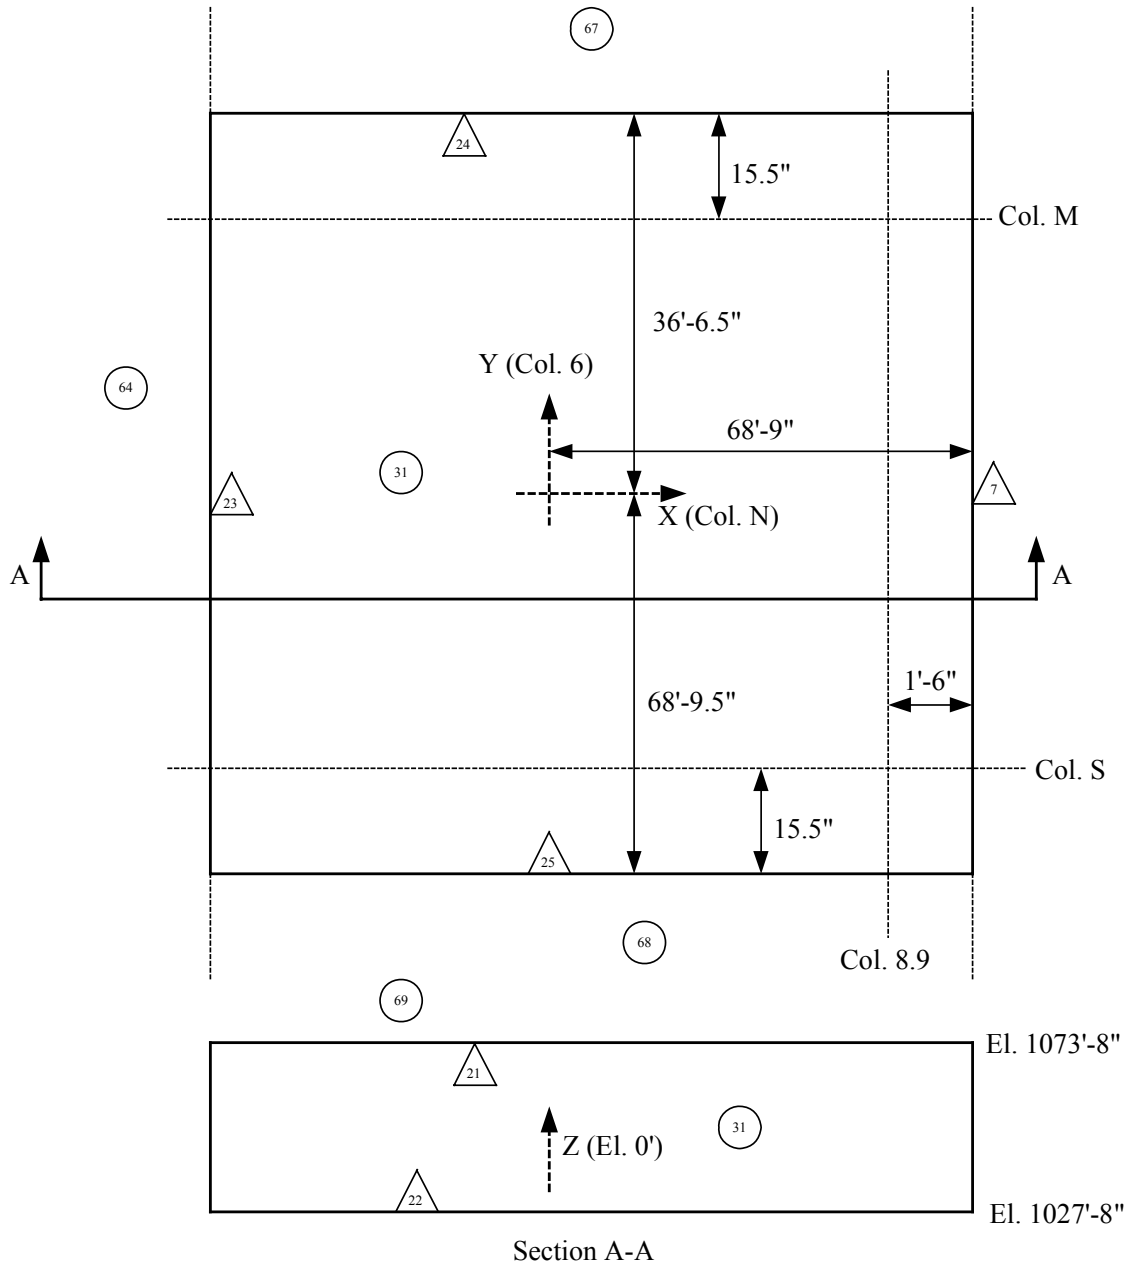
Geometry Model for the Reactor Building Refueling Floor, Elevation 1027'-8" (Not to Scale)
